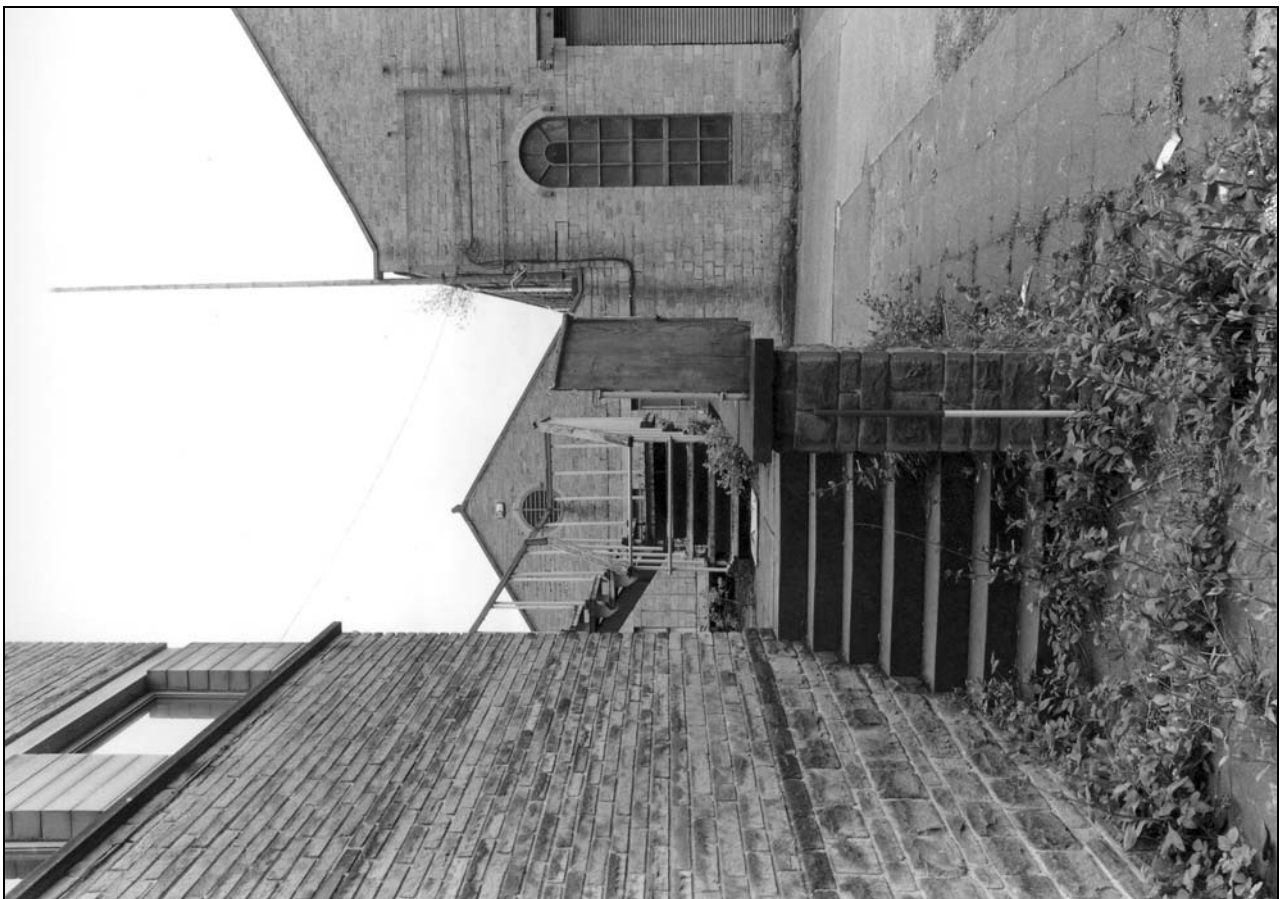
Foot of stairs to roof level, from the west (film 2, frame 9)
